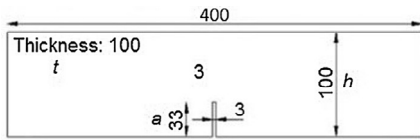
3PBT specimen's geometry and dimensions (mm).
